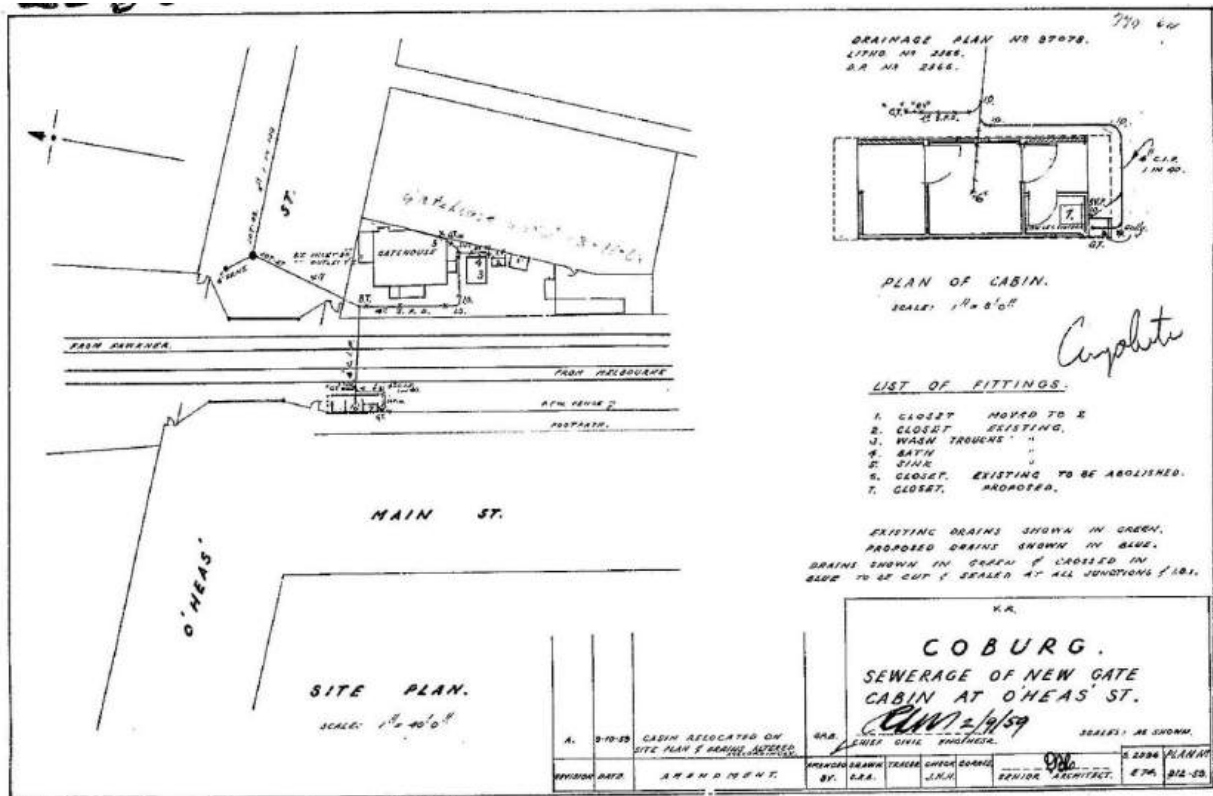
1959 Detail plan of proposed sewerage systems for the O'Heas Street Gatekeepers House showing the layout of the cabin and associated out-houses. (Public transport Victoria Drawing Management System. 10/06/2020).
